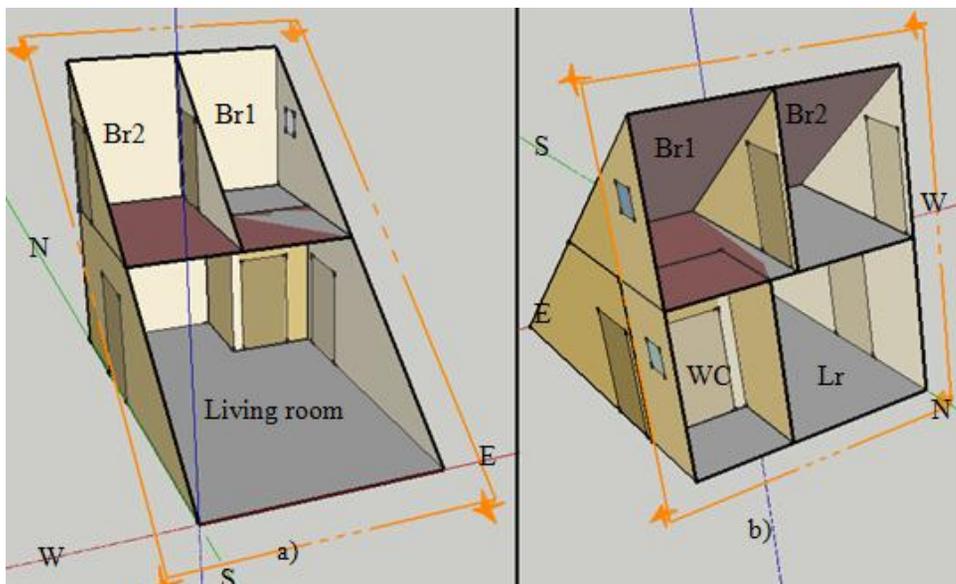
Geometrical definition of the residential house (Br-bedroom, Lr-Living room, WC-Bathroom) (a) South side; (b) North side.
